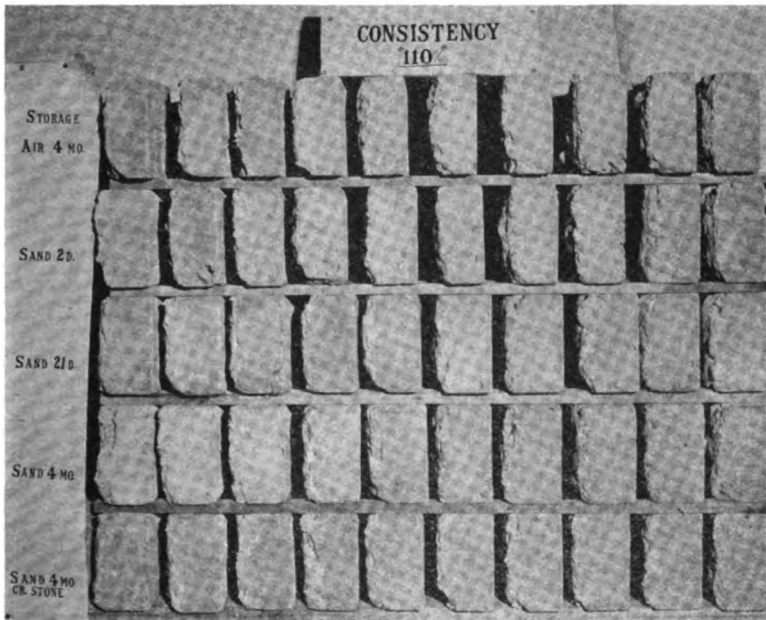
SIDE VIEW OF WEAR BLOCKS AFTER TEST.
